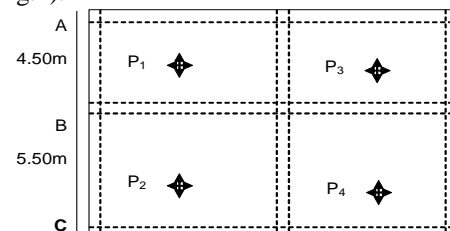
Typical Two-span, Two-way Beam and Slab Layout.
